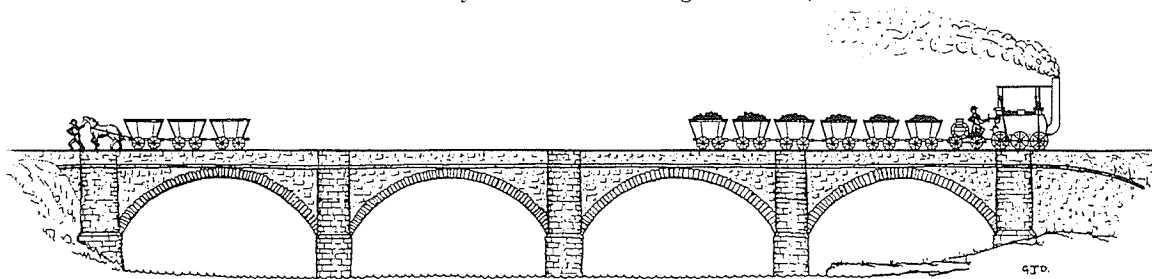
Conjectural view of Milton Bridge in 1816⁹⁾ looking south.
